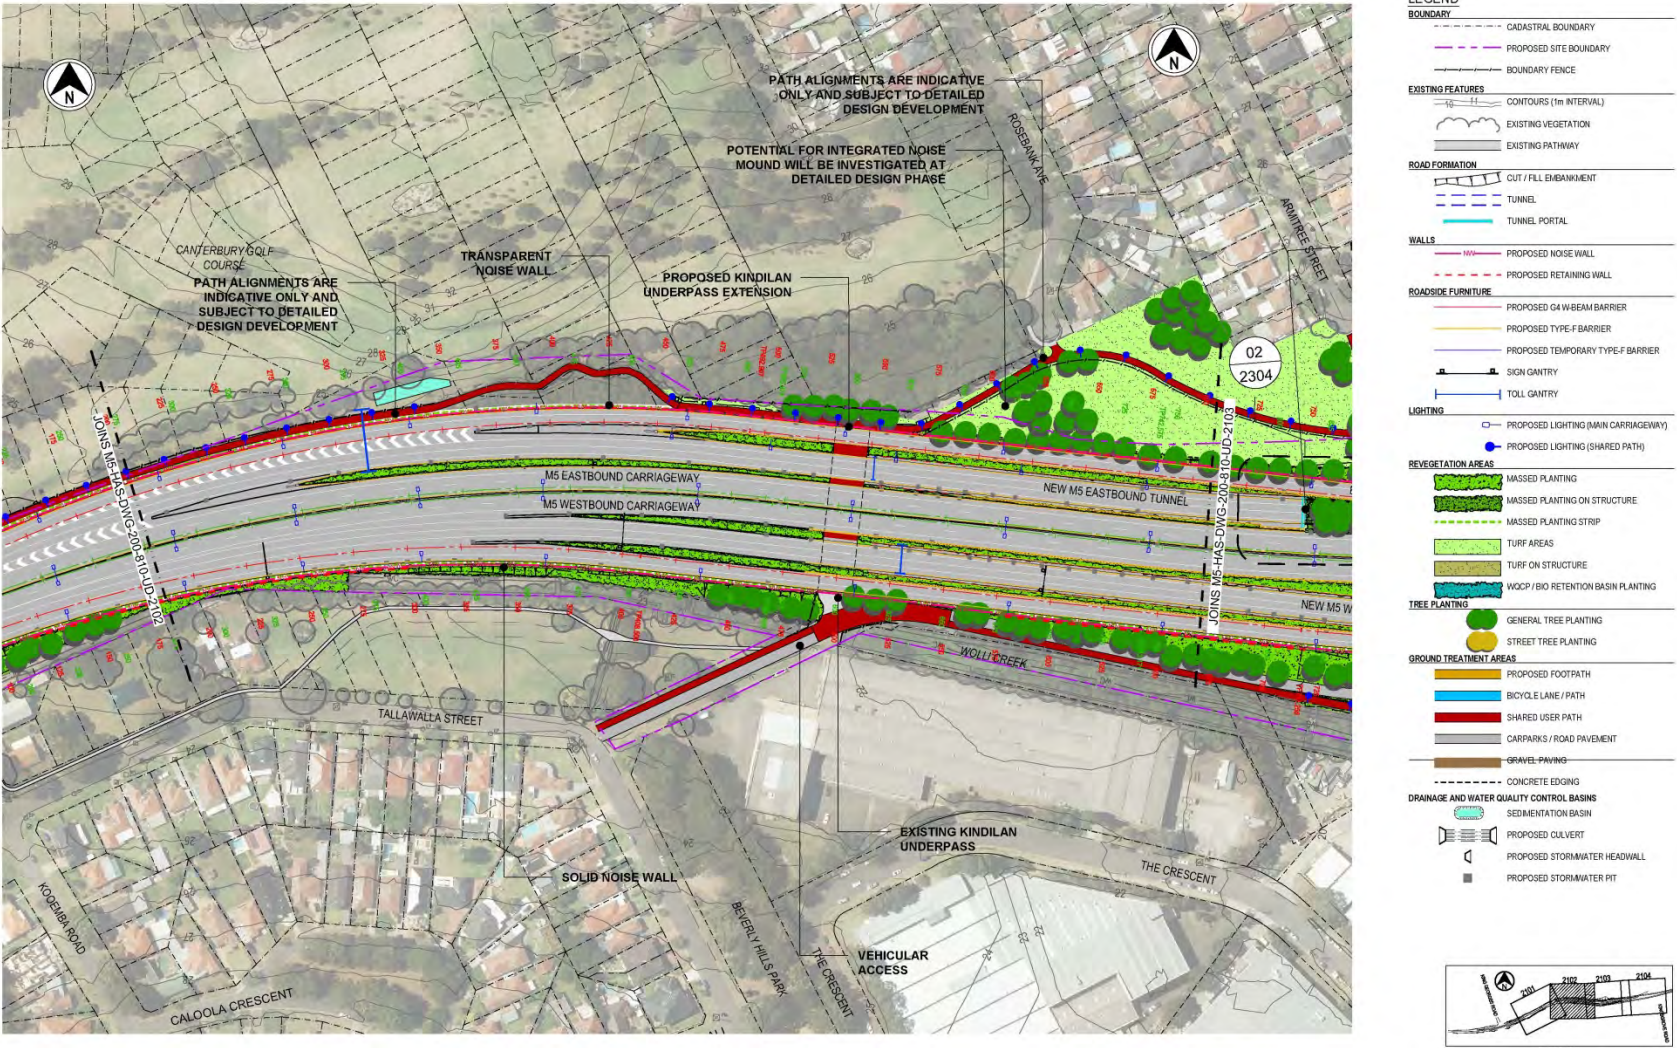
Concept design and planting plan for the western portion of the western surface works.
